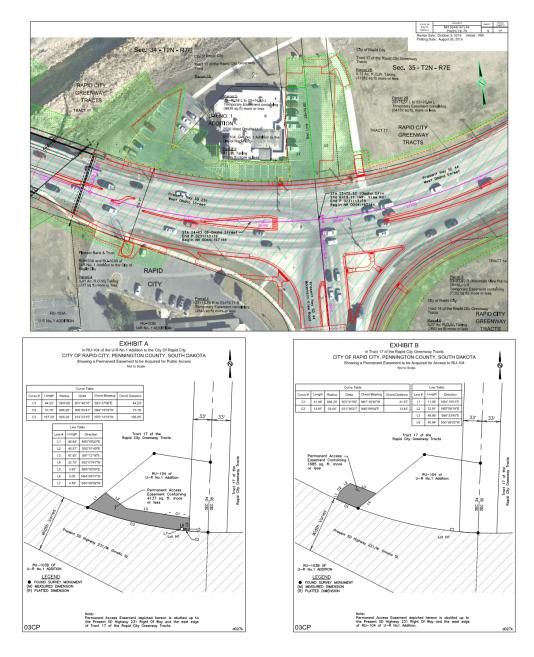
, Installation of Nontraversable Median on Reconstruction Project where Adjacent Property Owners Share a Common Access Requiring Cross Access Easements
